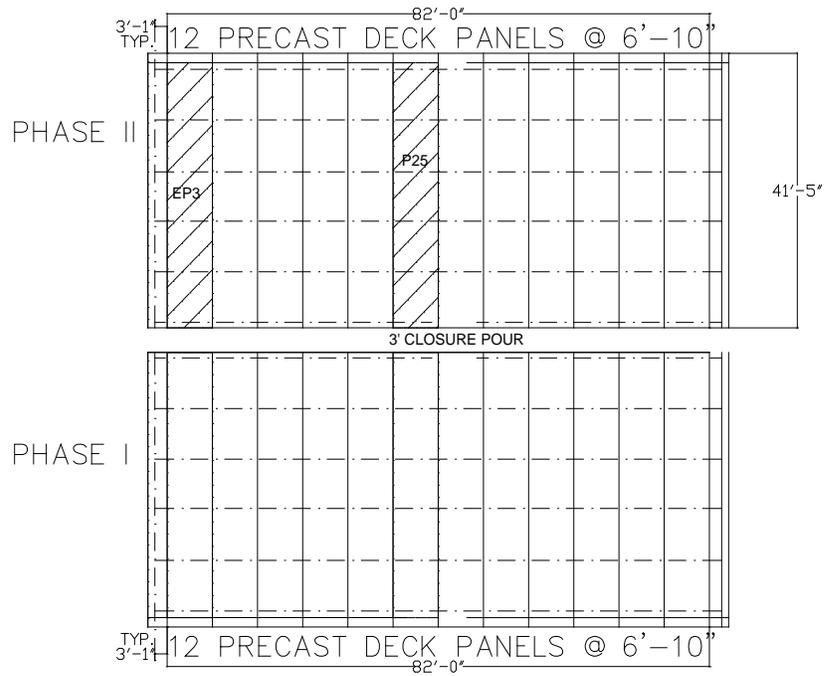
Plan view of Beaver Creek Bridge showing prestressed girders and deck panels.
